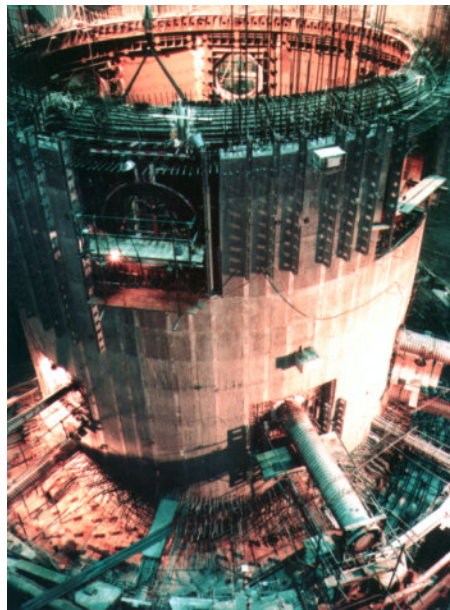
Construction of the THTR-300 pre-stressed concrete vessel.
